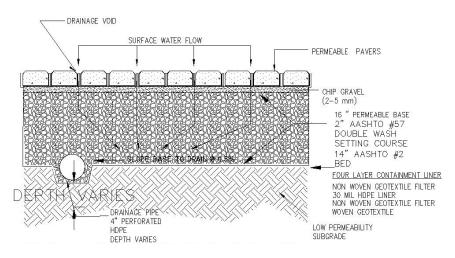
Typical permeable pavement cross-section. Not to scale.
